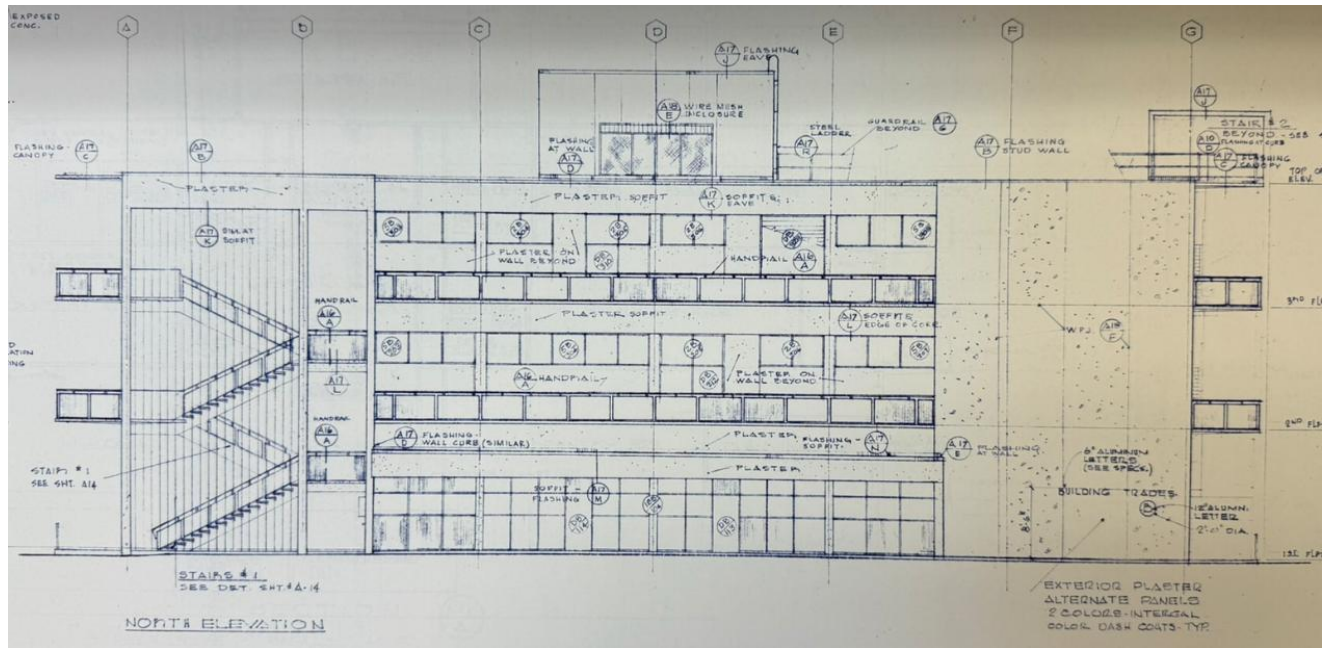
1959 drawing of CMU Building (E2), north elevation (LATTC 2025)
